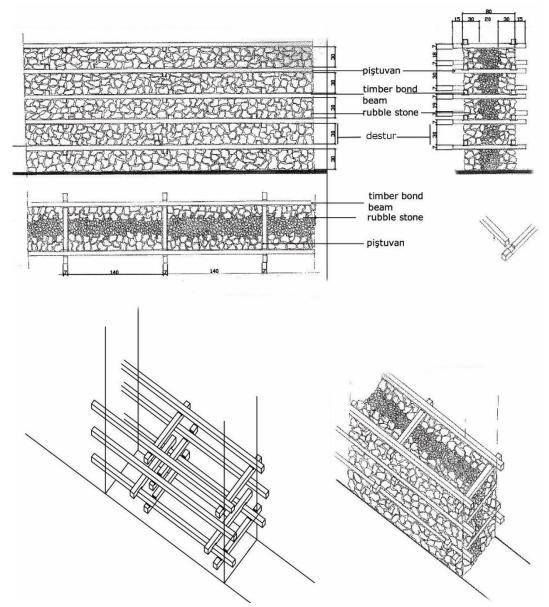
Düğmeli Duvar- Buttoned Wall (Çelik 2008)
